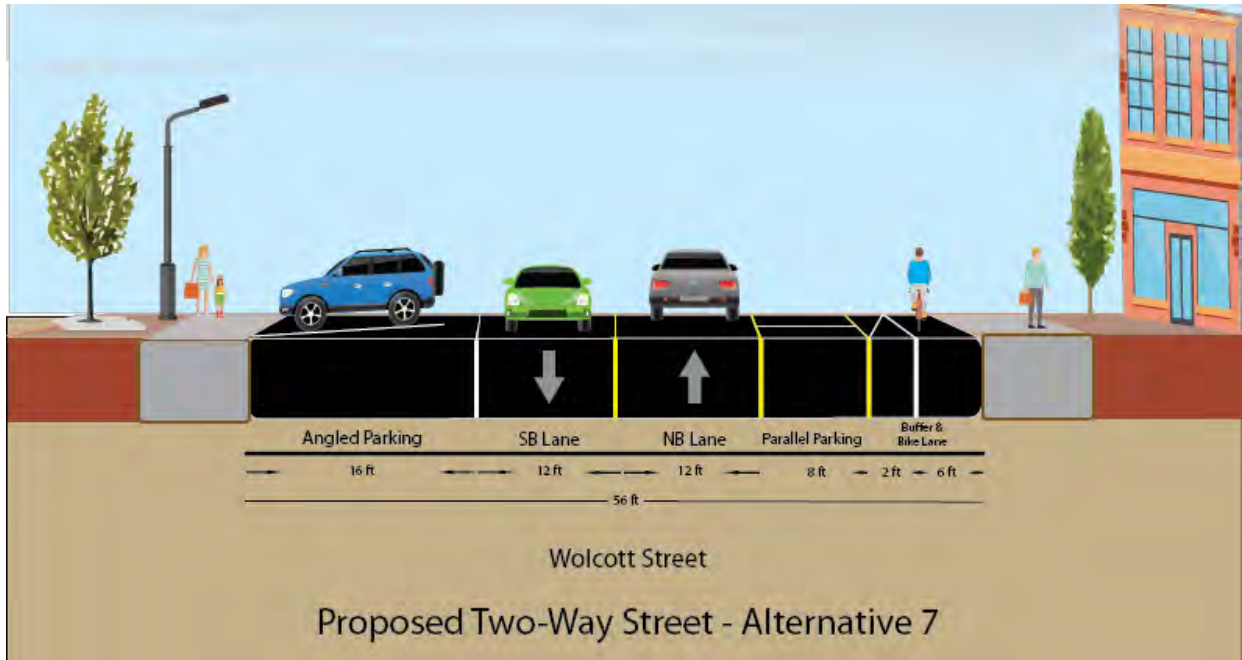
CONCEPTUAL TWO-WAY LANE CONFIGURATIONAL AND PAVEMENT MARKING
